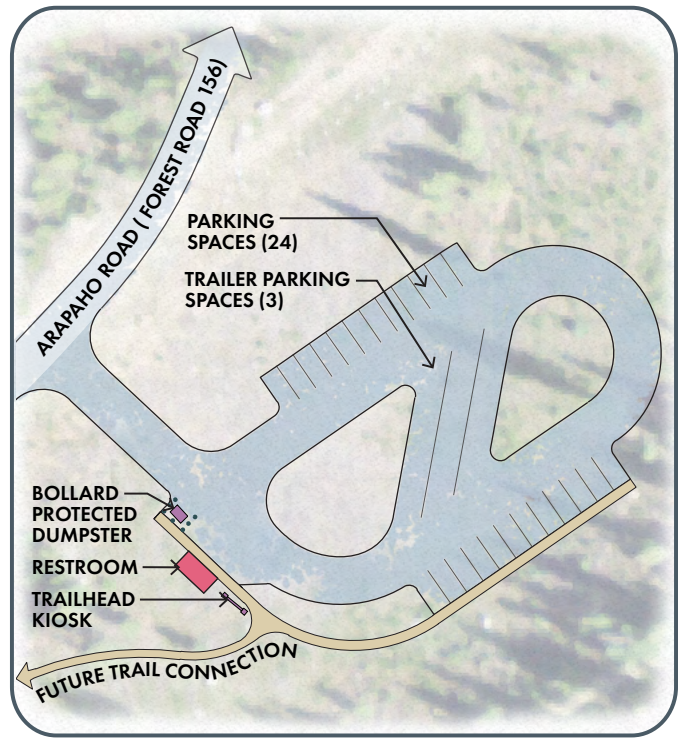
Existing trailhead parking at the end of Arapahoe Road in the Resort/US Forest Service Permit Area.
